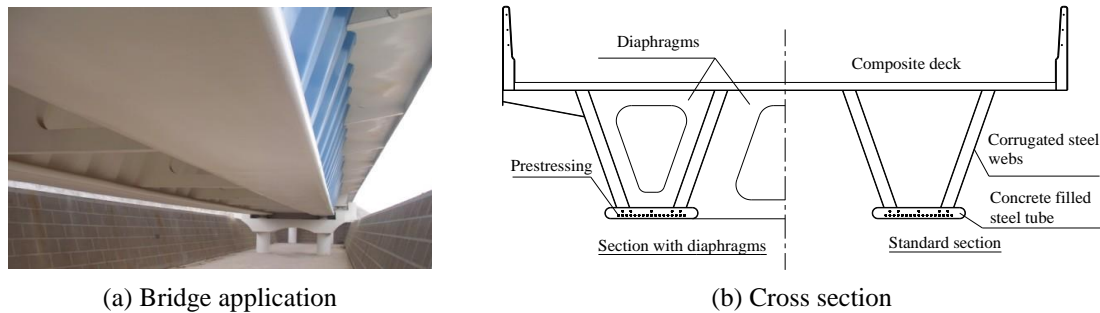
Composite box girder bridge with corrugated webs and steel tube slab
